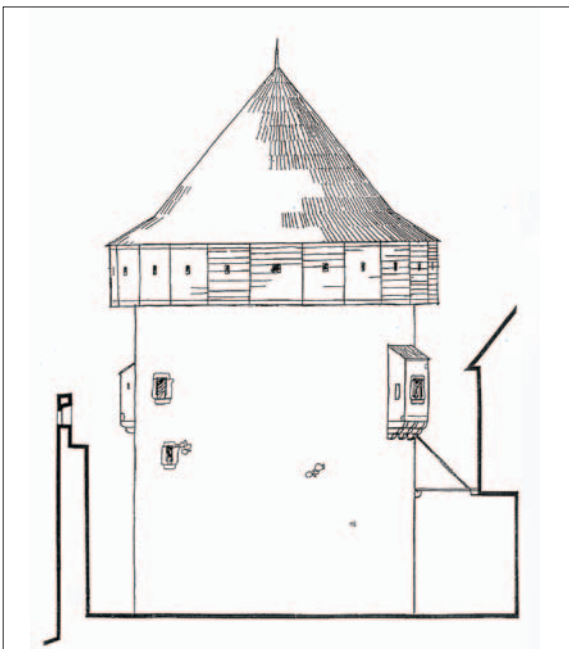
Gvozdansko castle, defense tower with a circular layout and an outward projecting battlement supported by corbels (drawing by: Z. Horvat)
